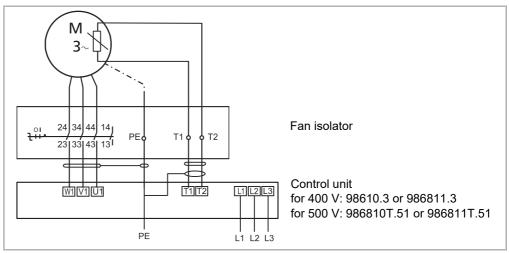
Electrical connection - 1-stage operation - Unit with fan switch and switchgear
